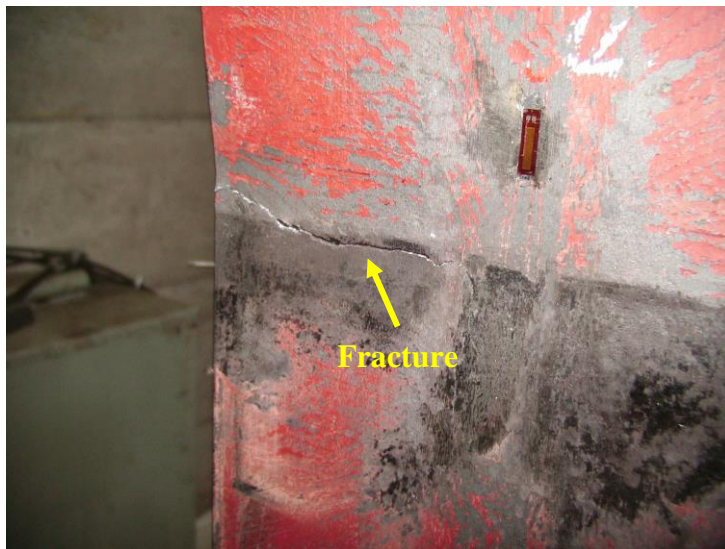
Fracture occurs above the 400 mm-high steel base fixture in other side of HP220x57 specimen.
